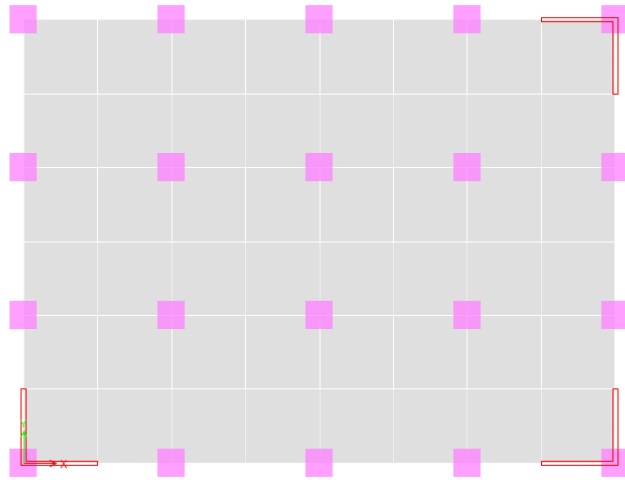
2D plan of 8th story rectangular shape building case SW4
